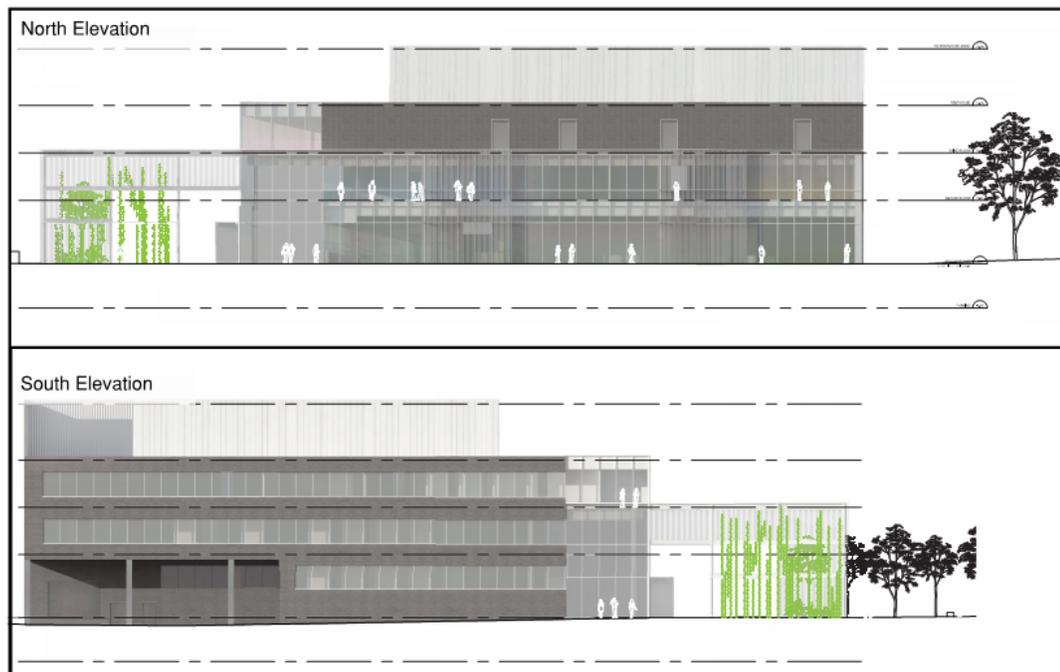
NORTH AND SOUTH ELEVATIONS
